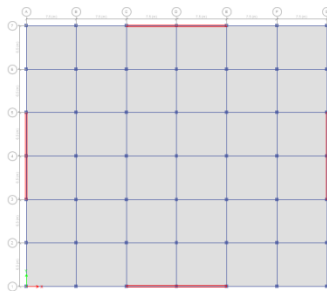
Plan shown with SWP-03[Shear wall position-04] .
